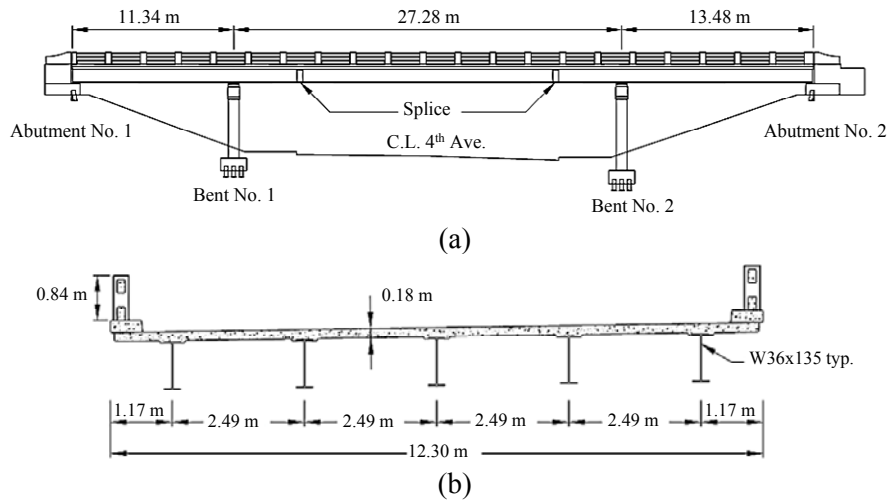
I-40 westbound bridge over 4th Avenue: (a) Longitudinal profile (b) Cross-section (modified from Ragland 2011)
